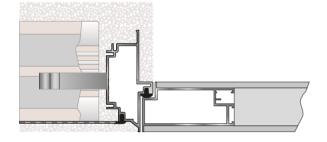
MOUNTING OF PIU FRAME IN MASONRY WALL
